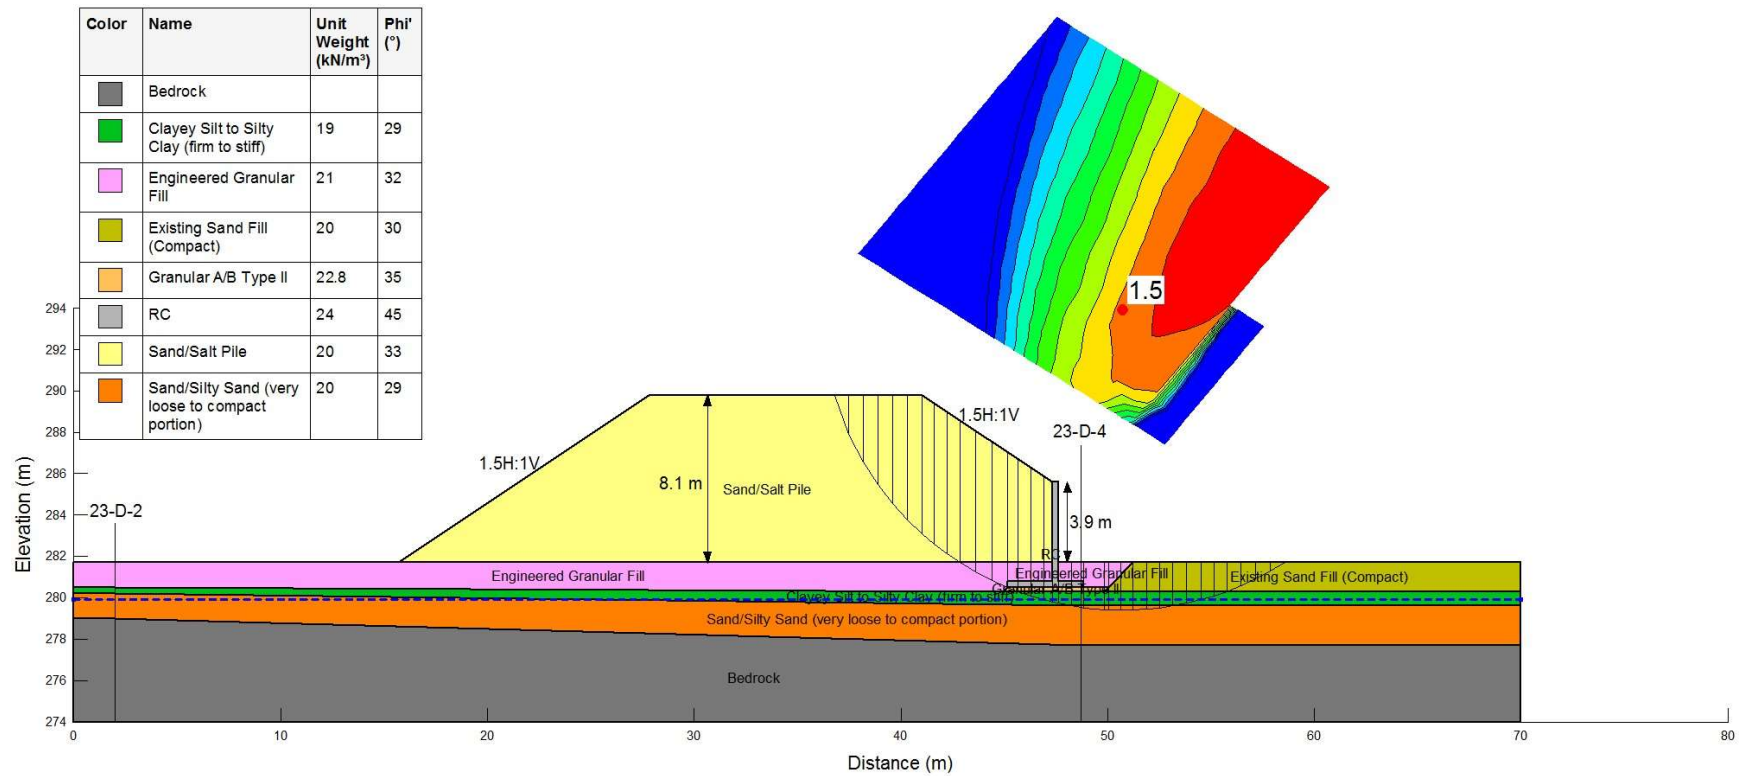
Slope stability analysis of new material storage building – N-S section, north side wall – drained static analysis
